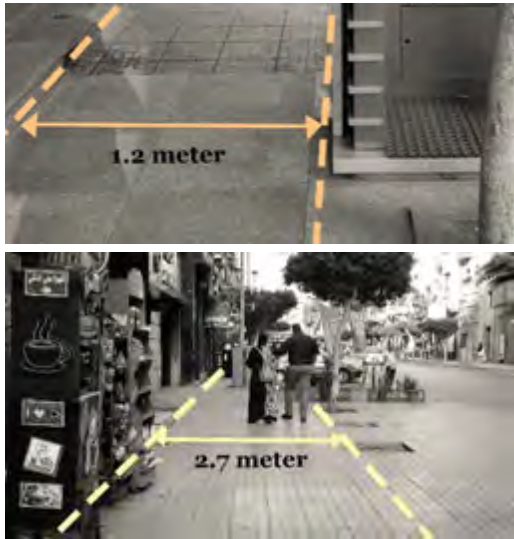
10 - Curb extension in left side of Adly Street. Source: Author
